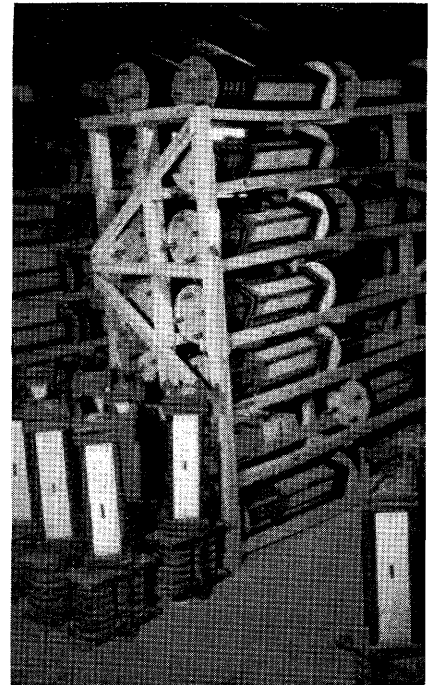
Creep and shrinkage specimens air dried inside. Specimens with double springs are loaded to 3000 psi.
